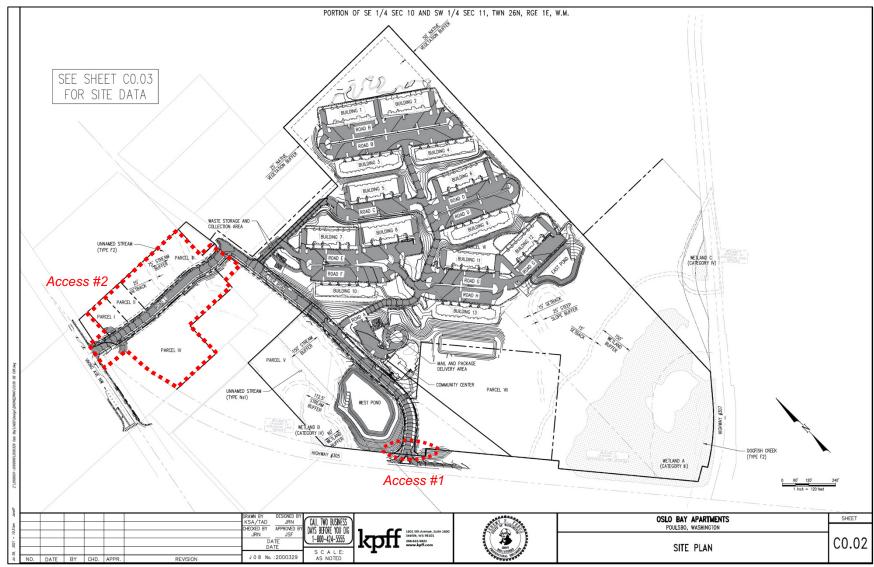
Proposed site plan, provided by KPFF, marked with areas surveyed in 2018.
